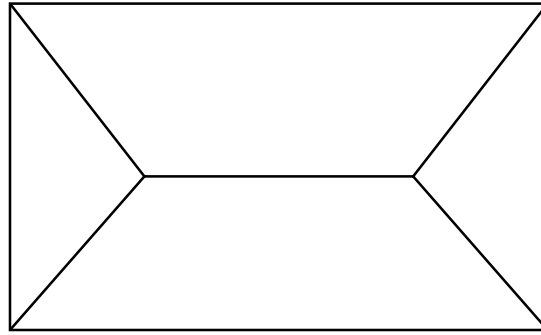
Yield lines for a rectangular roof plate (plan view).
